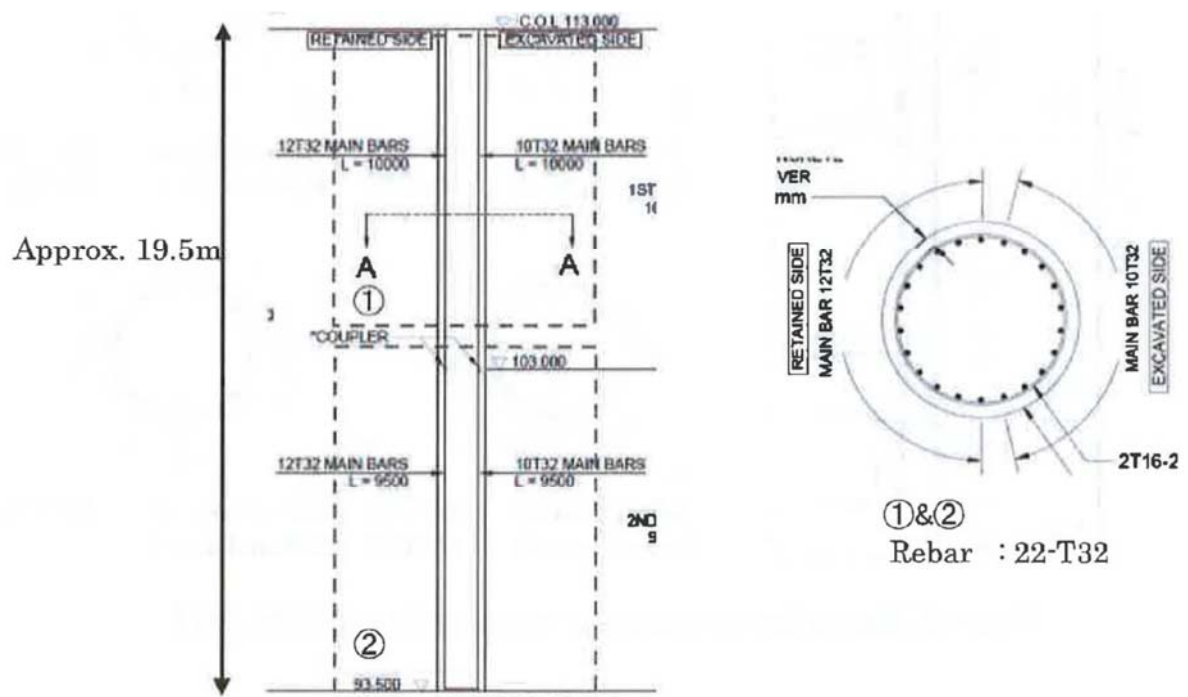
Typical rebar arrangement of the Alternative design (SBP-34C)
